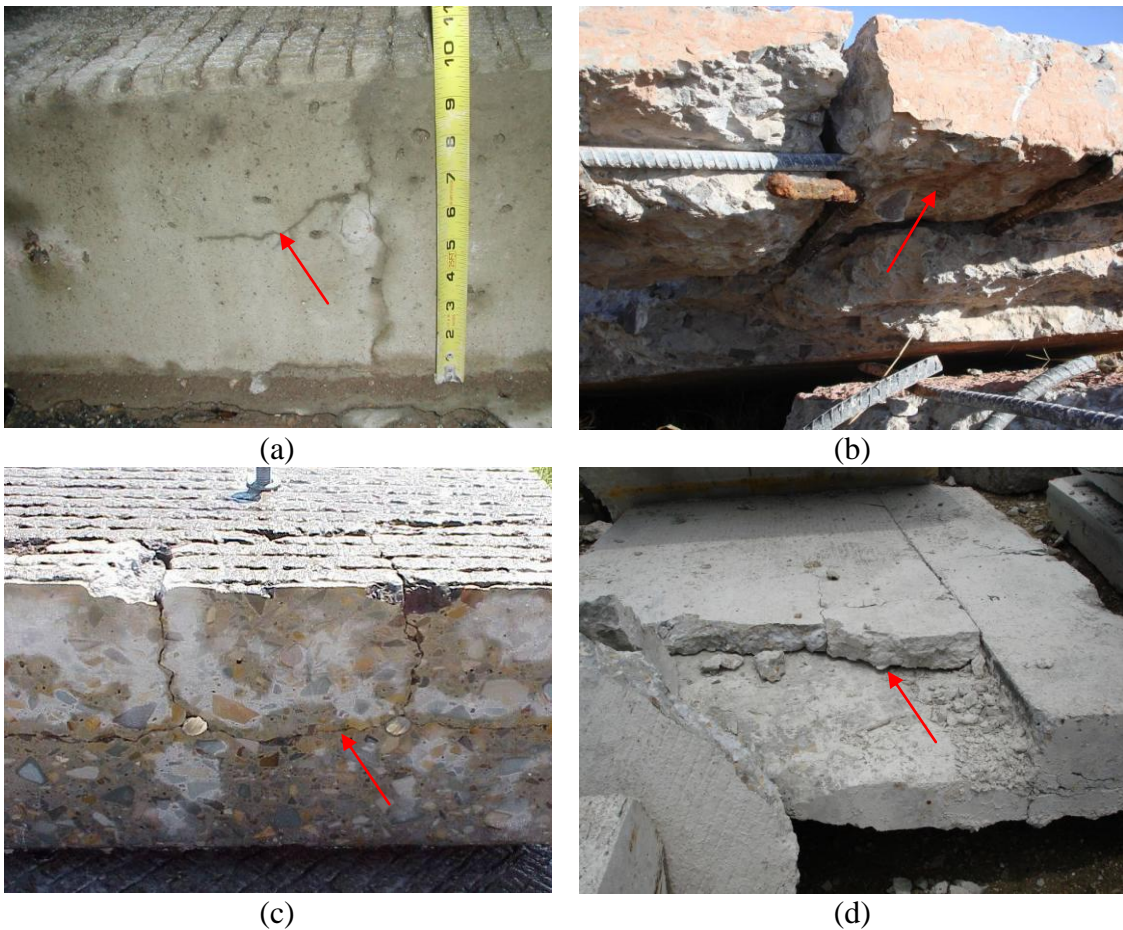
Horizontal cracking in CRCP (photo courtesy: Won)
